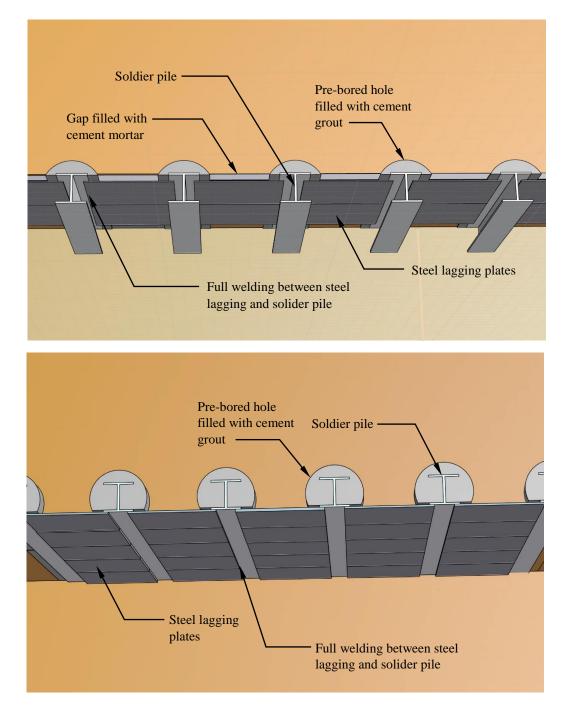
Typical Soldier Pile Wall with Steel Lagging
